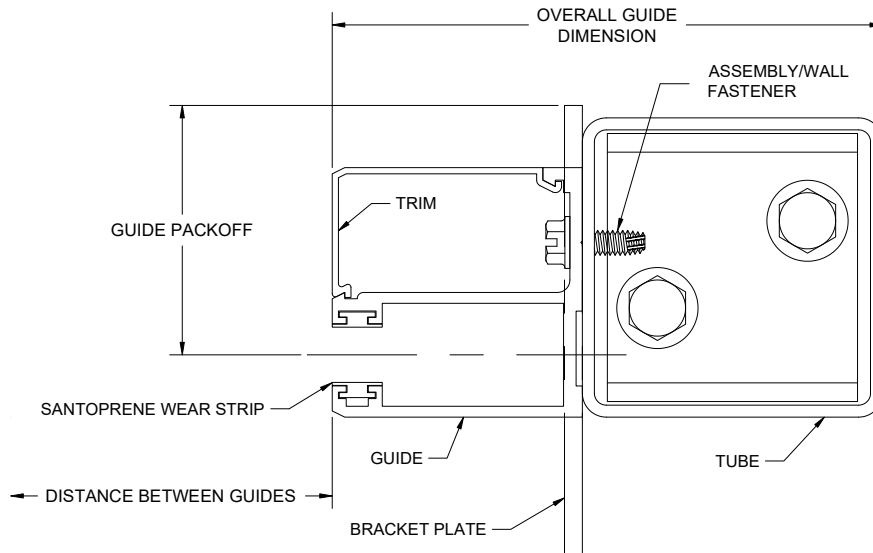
Face of Wall “E” Guide Mounting to Tube
